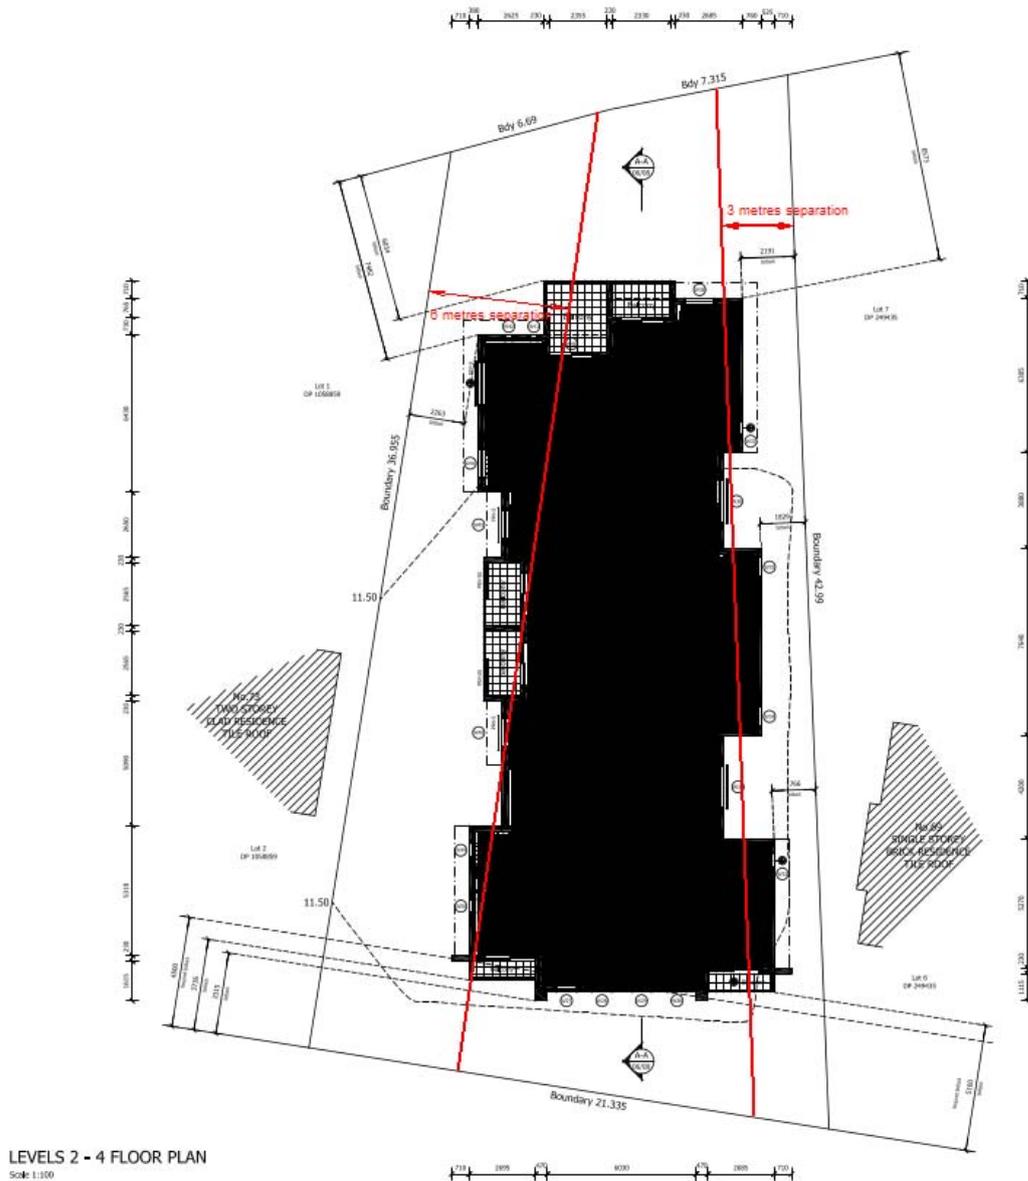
Extract of the floor plan that shows the extent of non-compliance with Building Setbacks on levels 2 - 4
